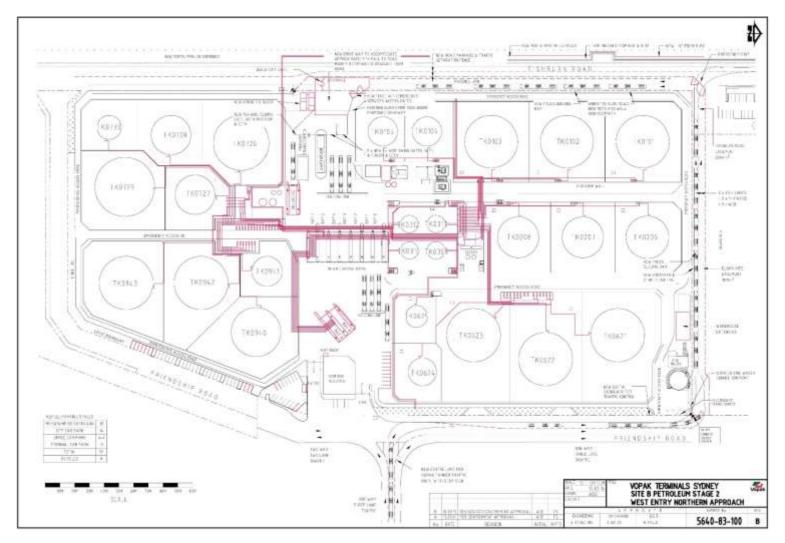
PROPOSED FUTURE SITE B TRAFFIC PLAN – WEST ENTRY
